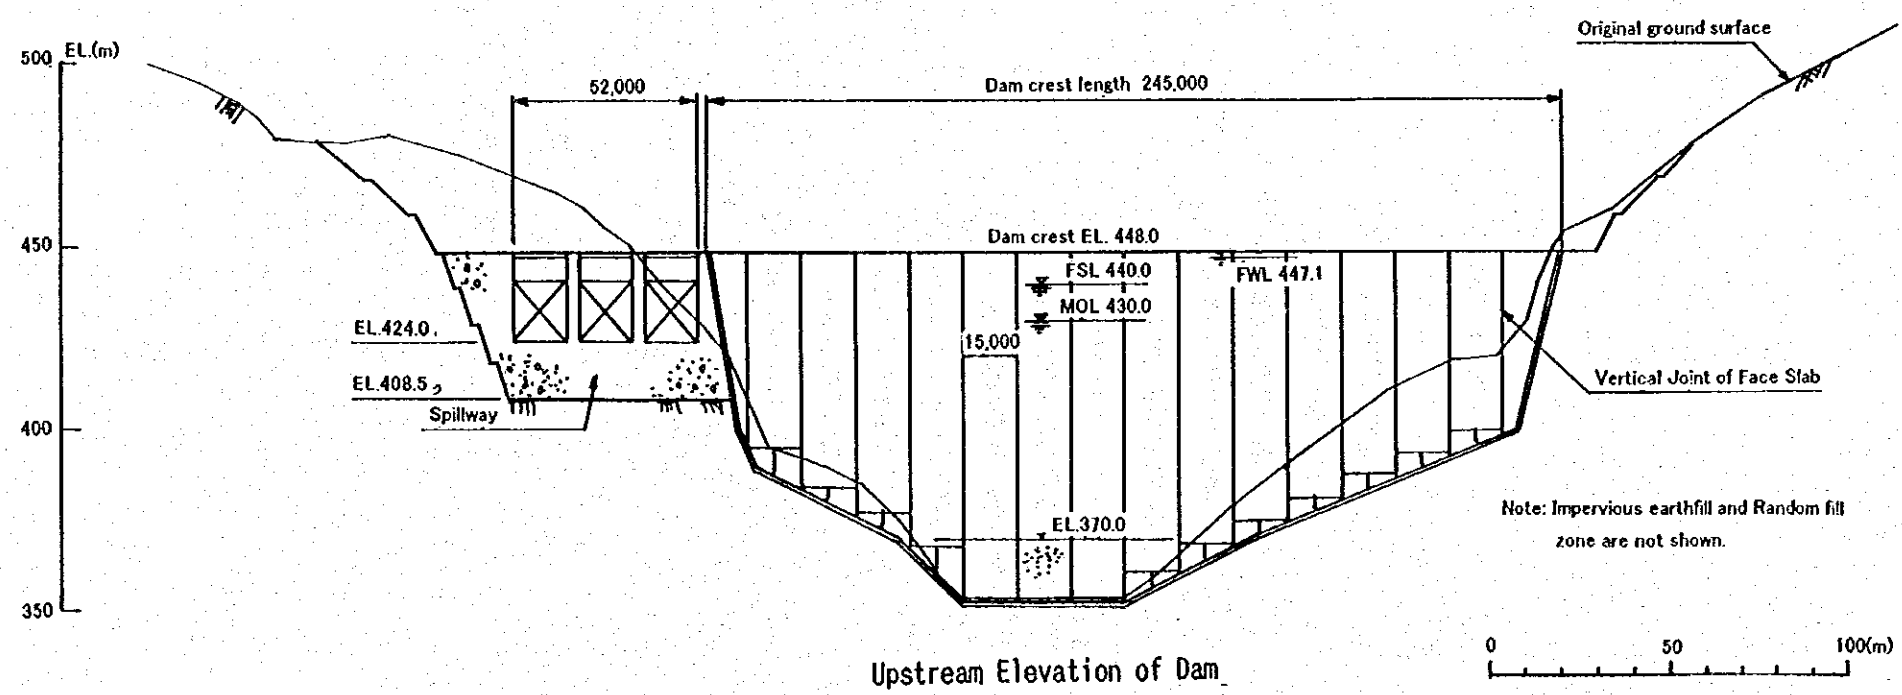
Earth Core Type Rockfill Dam for Dong Nai No.3 Dam (2/2)
